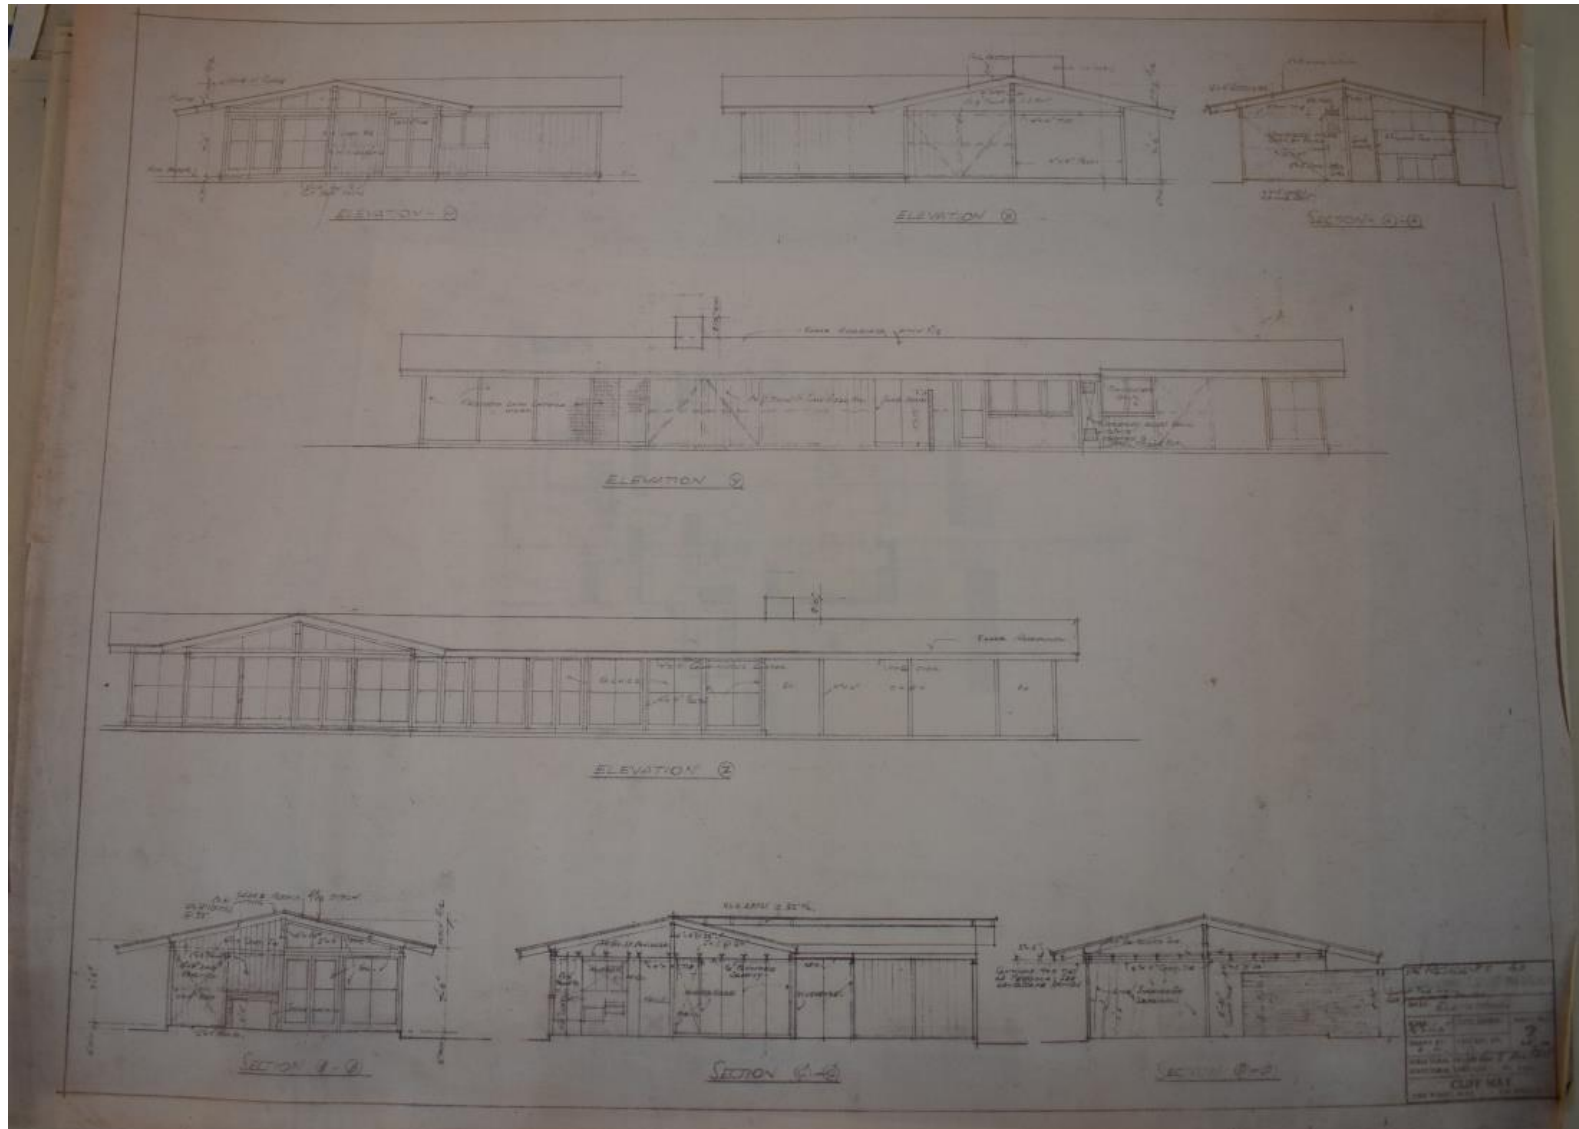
May's Updated Design for Aldrich House #2 – Elevation Plan (May circa 1950)
